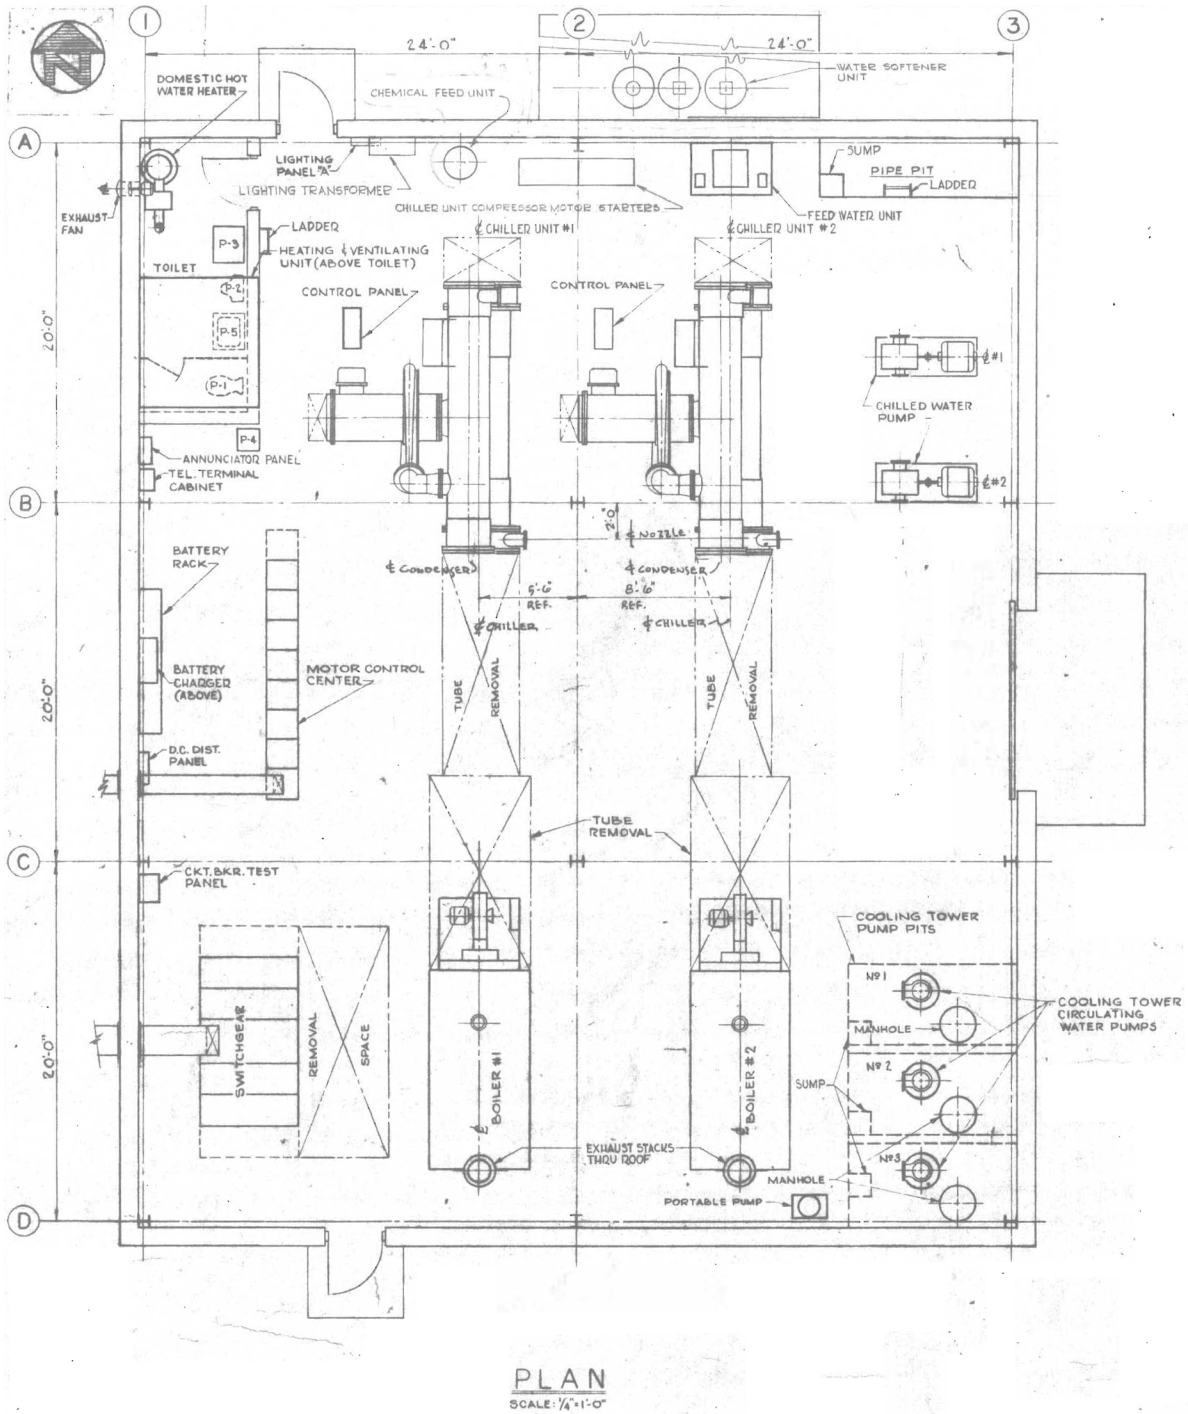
Property 24066 floor plan from 1959 WS-IO plans.
